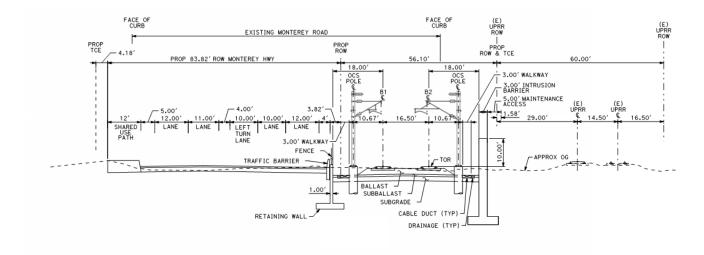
Typical Sections in Subsection Morgan Hill and Gilroy (Embankment)
